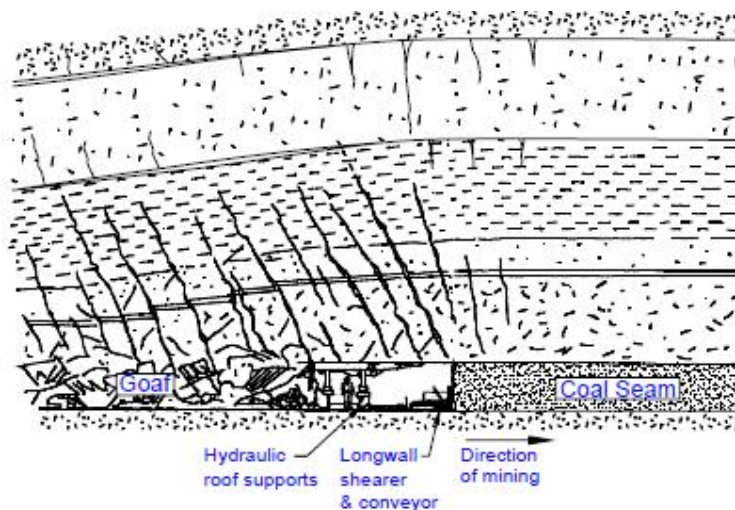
Illustration of typical longwall face (from Mine Subsidence Engineering Consultants, 2007)
